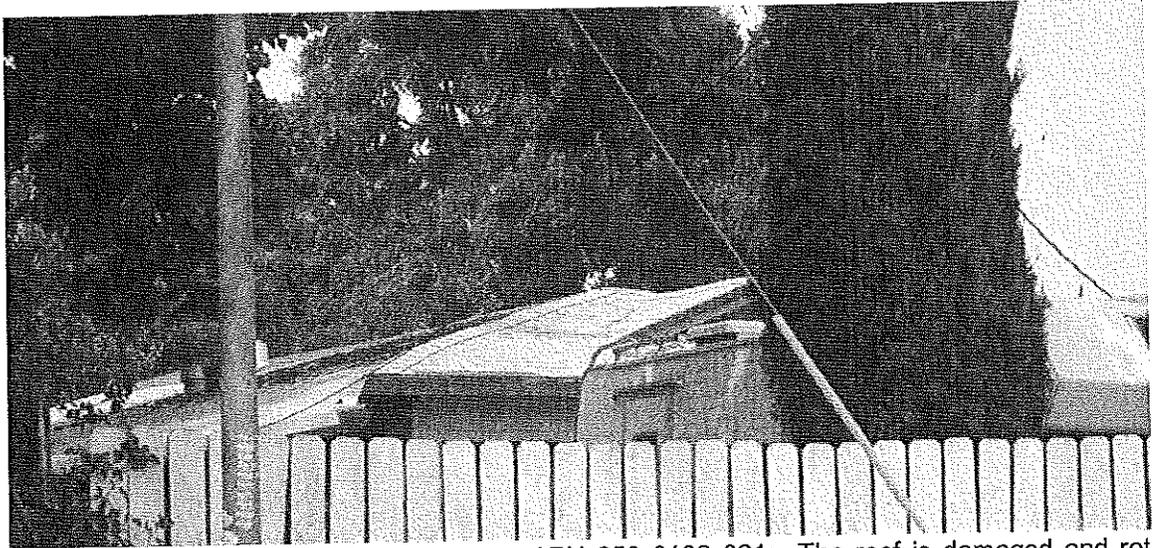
500 Block of South Avenue, APN 250 0102 021: The roof is damaged and rotting, creating a safety hazard for residents.
